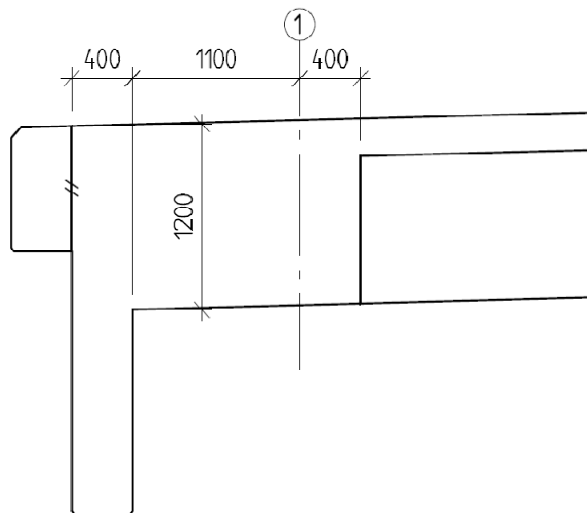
Detail of the transversal support beam of bridge 13-799-1 in Gulbranna. Adapted from Batman (2010).
